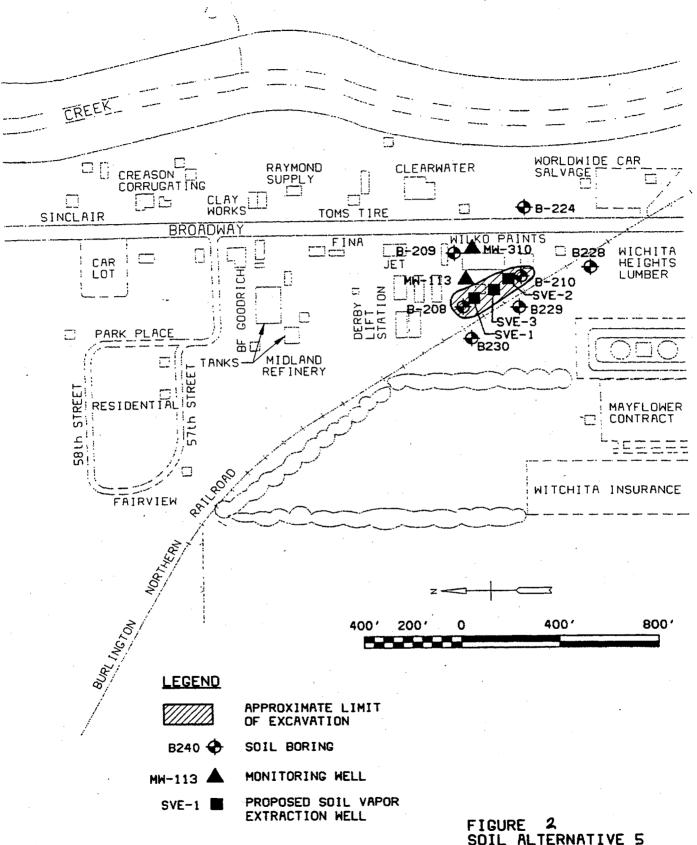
SOIL ALTERNATIVE 5 SITE PLAN - IN SITU SOIL VAPOR EXTRACTION 57TH AND NORTH BROADWAY SITE Sedgwick County, Kansas. Much of the total area and all of the area which is underlain by the contaminated plume exceeding drinking water standards is now served by public water.
